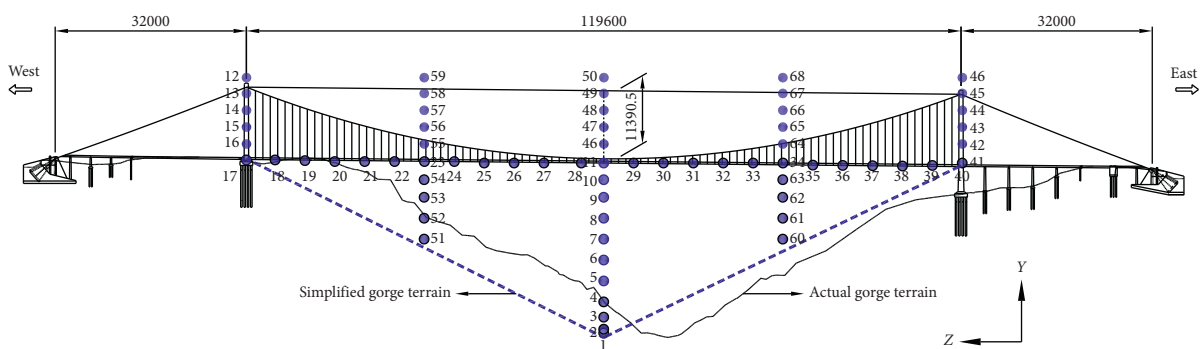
Bridge site and the monitoring points (unit: cm).
